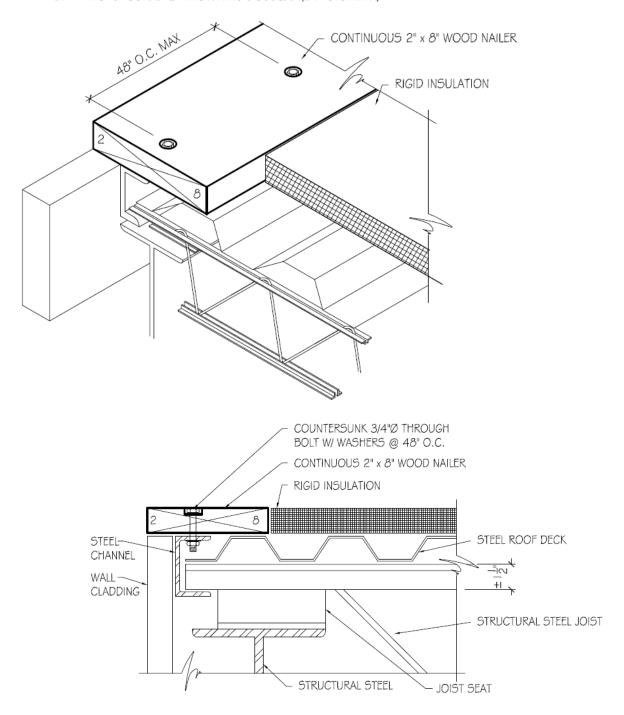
ROOF EDGE WOOD BLOCKING - THROUGH BOLT ANCHORS
